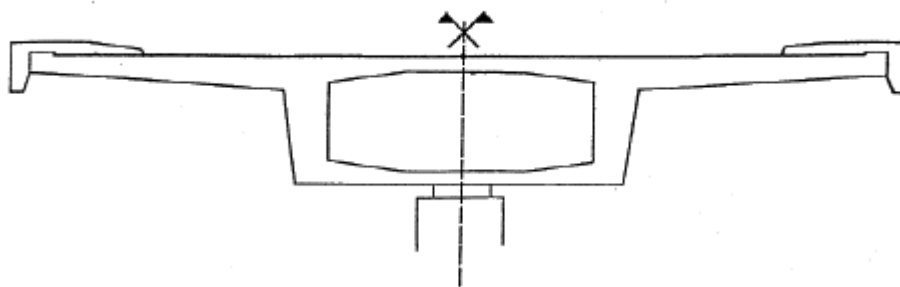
Post-tensioned Continuous Plate Girder
